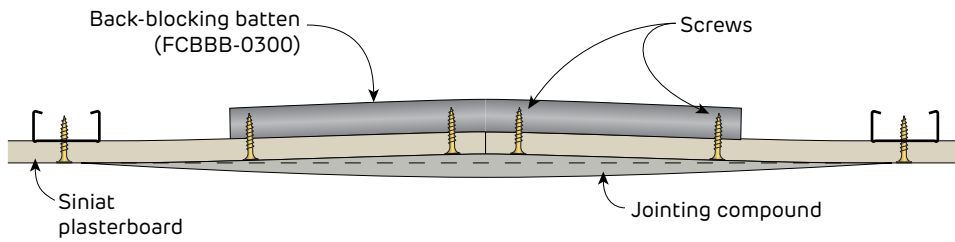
Creating a Recess on a Ceiling Butt Joint using Back-Blocking Battens
